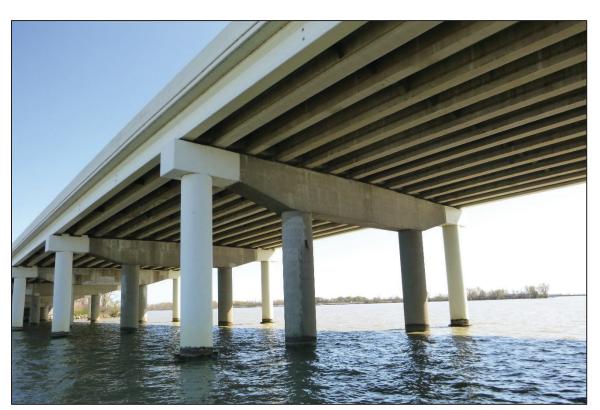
View of the South Face of Bent 5, Looking Northeast.
